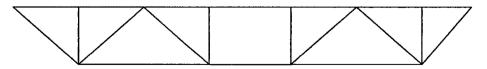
Warren Truss with Vierendeel Panel and Vertical Members
